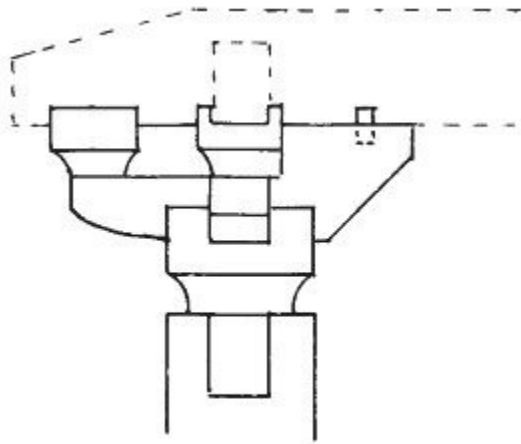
The Picture Hall after installation of the bracket complexes to support the roof load.
